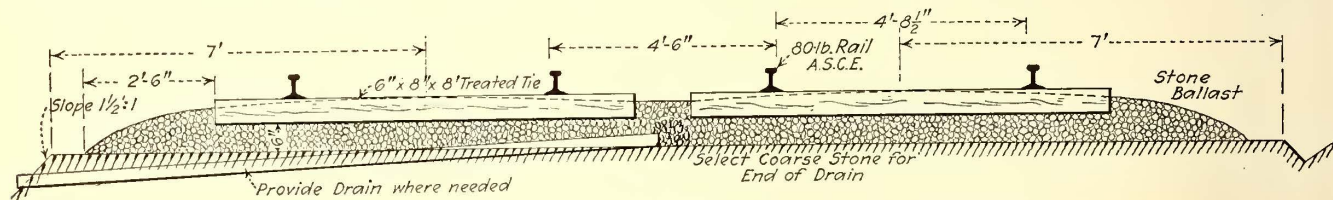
SAMPLE SUBURBAN DOUBLE-TRACK CONSTRUCTION
